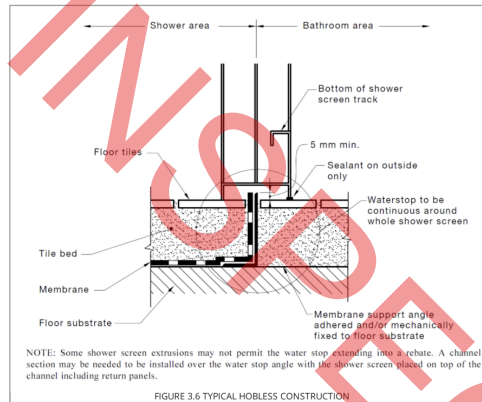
TYPICAL HOBLESS CONSTRUCTION
